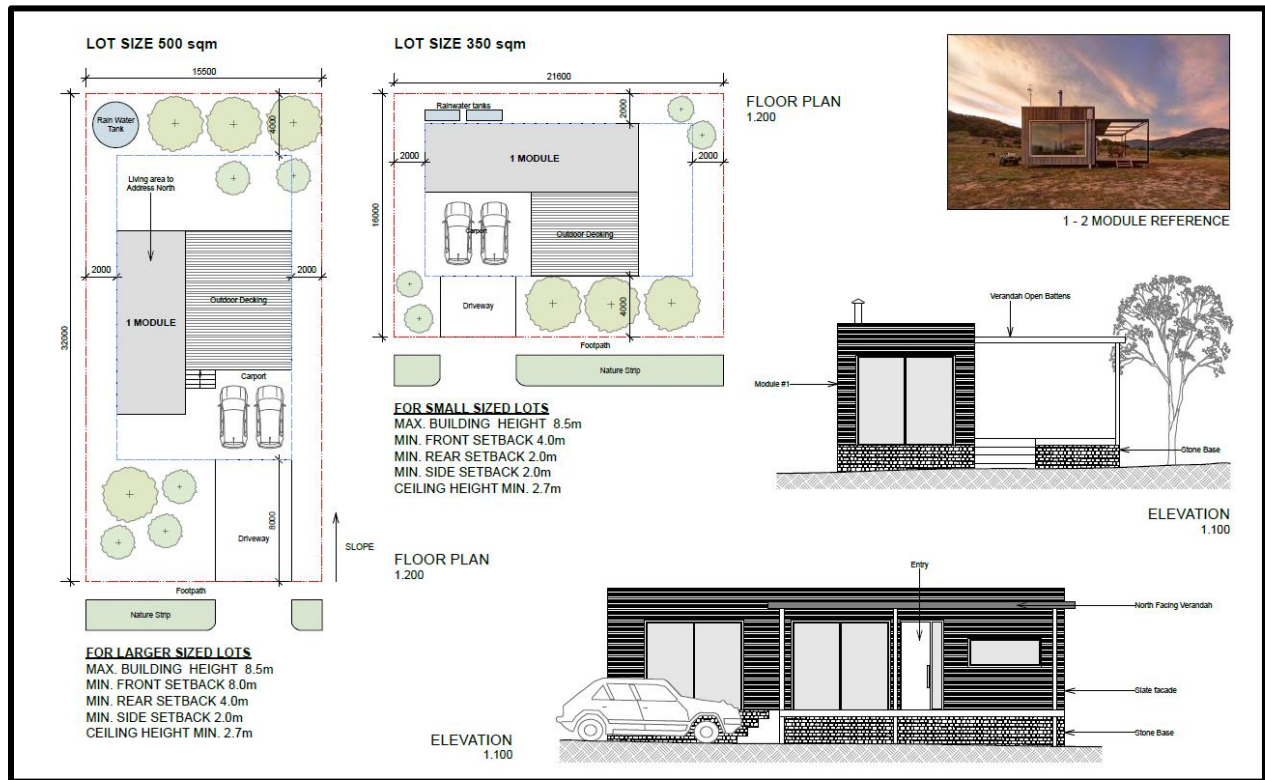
Typical Detached Dwelling (Source: Robert Harwood Architects)
